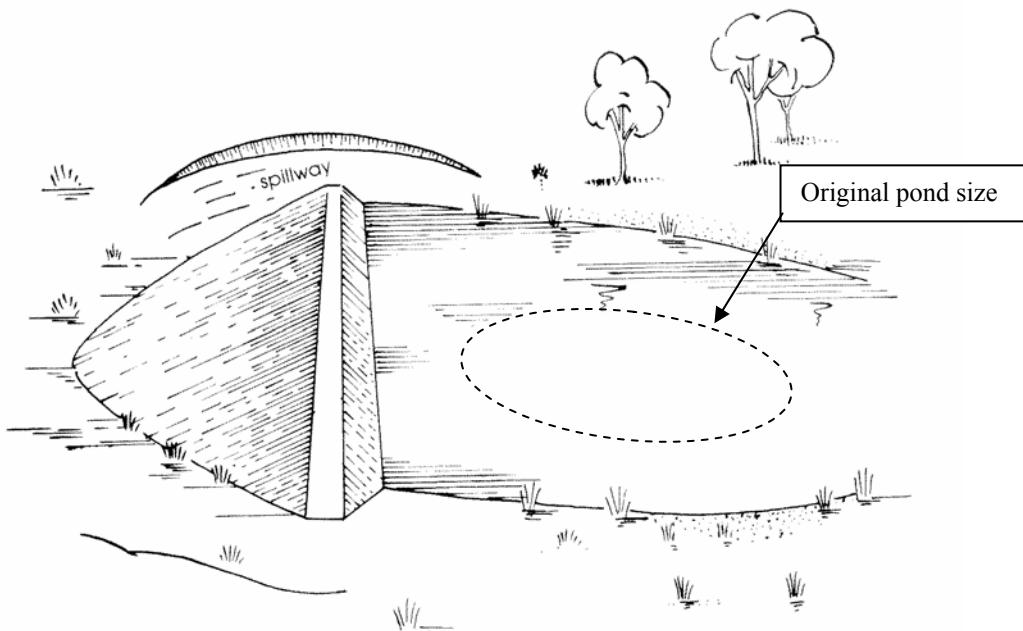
Embankment Construction to Increase Natural Pond Storage Capacity
